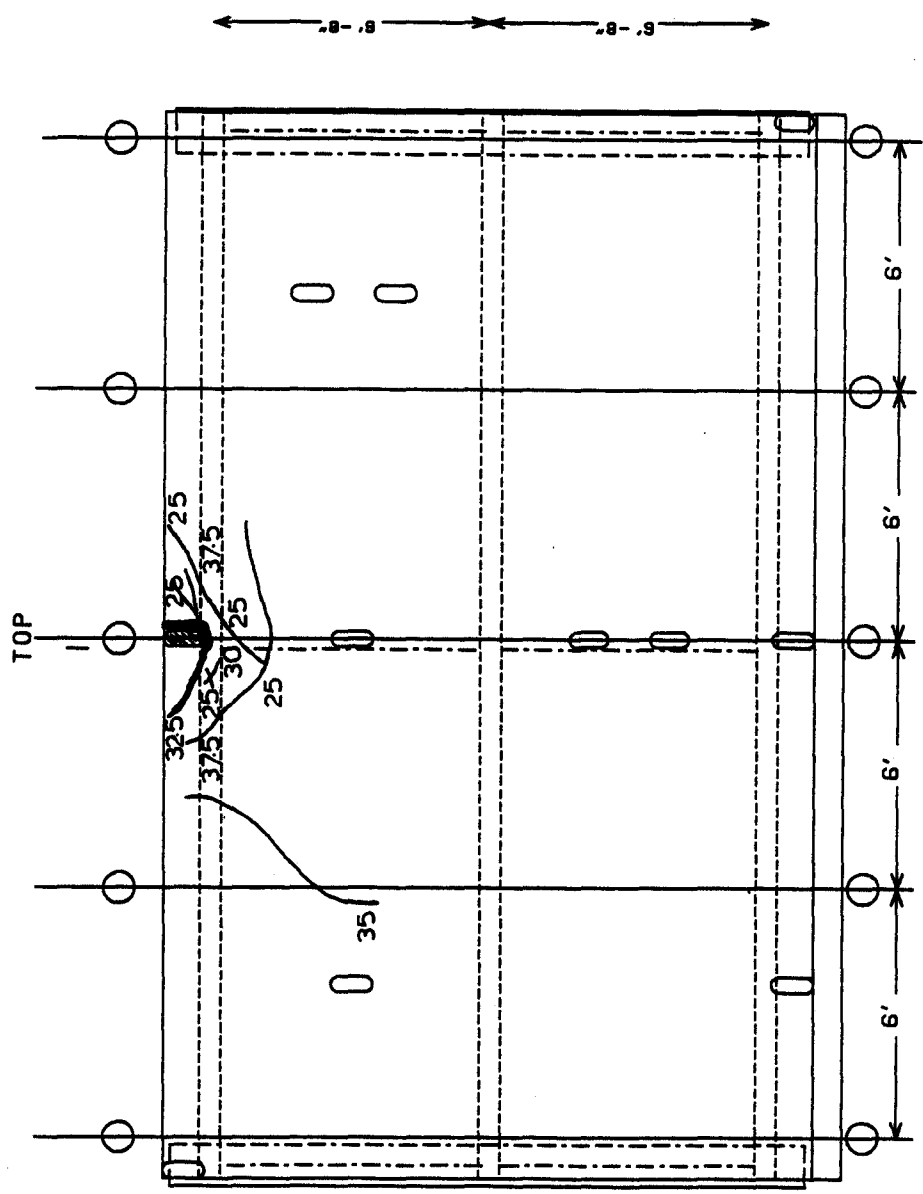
Top Cracking Pattern (First Bridge - Test No. 2)
